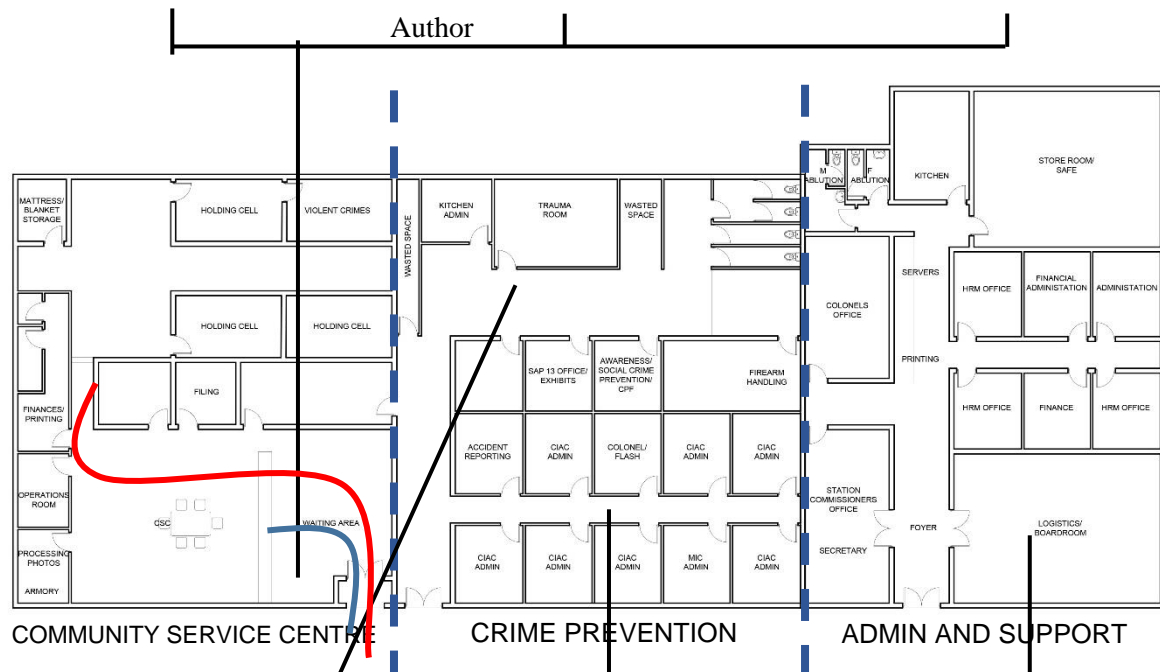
Newlands East SAPS Floor Plan. Source: Author.
